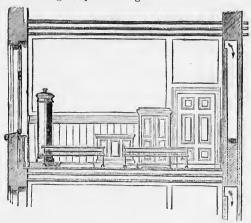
Section of School-Room (No. 2) showing German System of Ventilation.
